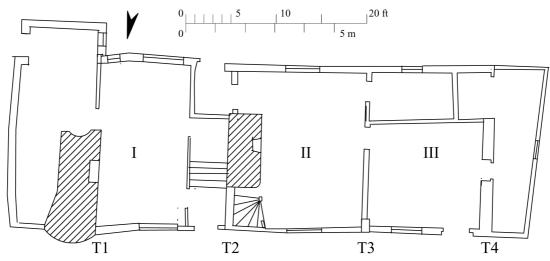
Plan, showing truss and bay numbering (after a plan by W. E. Godfrey).
